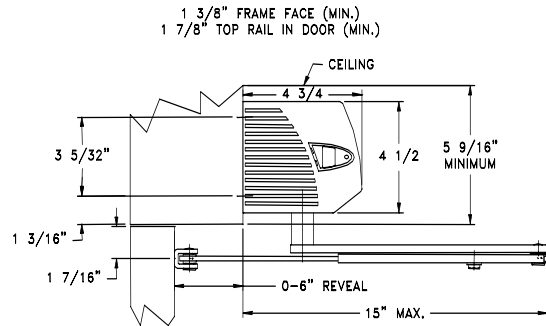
OPERATOR CLEARANCES – PUSH ARM
